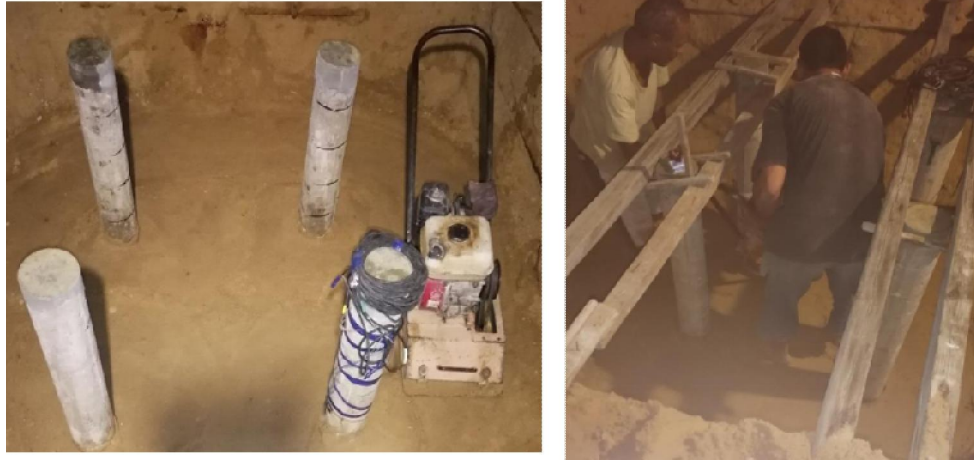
Placing piles and keeping the distance between piles (6-diameters from center to center) – group of four piles
